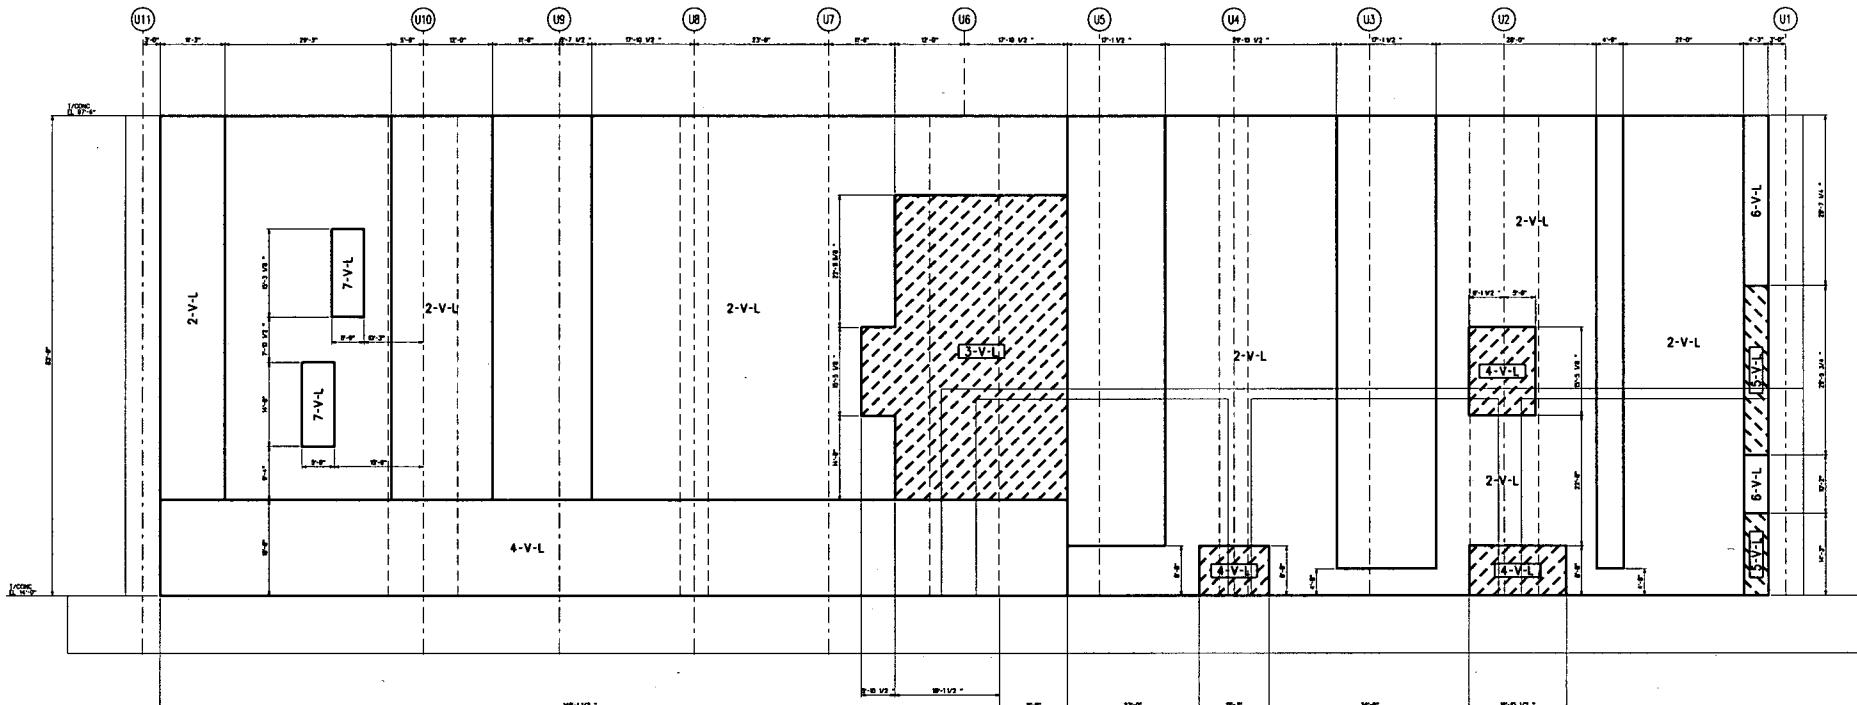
BASIN NORTH WALL LOOKING SOUTH
